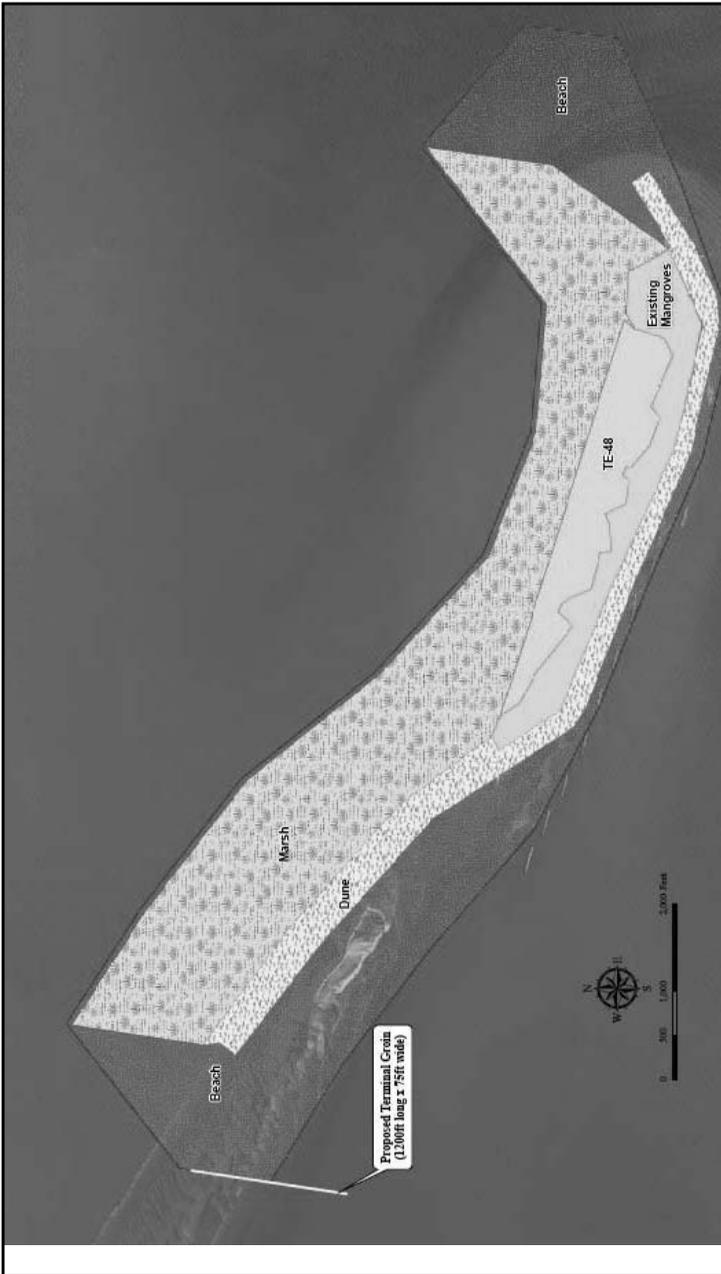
Raccoon Island Plan E with Terminal Groin
